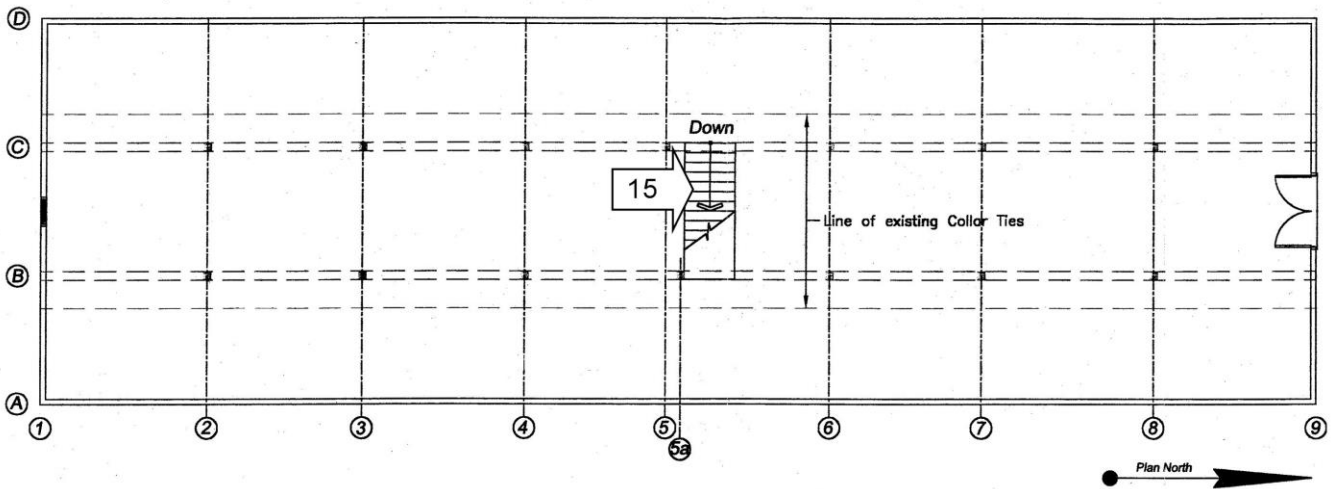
Storehouse second floor plan and photo key. (Image from Maine Bureau of Parks and Lands files.)
